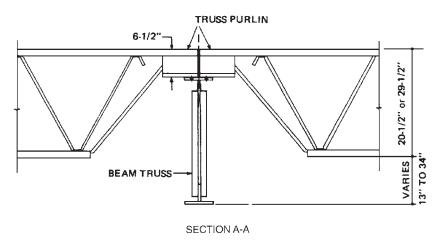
Details of Butler's Landmark Building. (Butler Manufacturing Co.)
